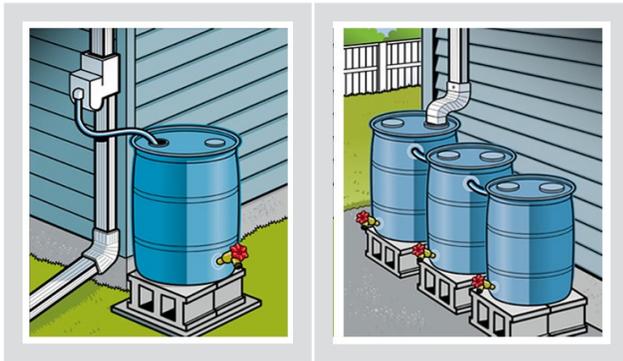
Rain Barrel Placement to Capture Roof Drainage.
